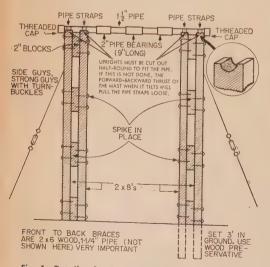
Details of crib construction. Guy wires are used for side support while 2x4 or pipe braces (not shown) are used for front to back support.
